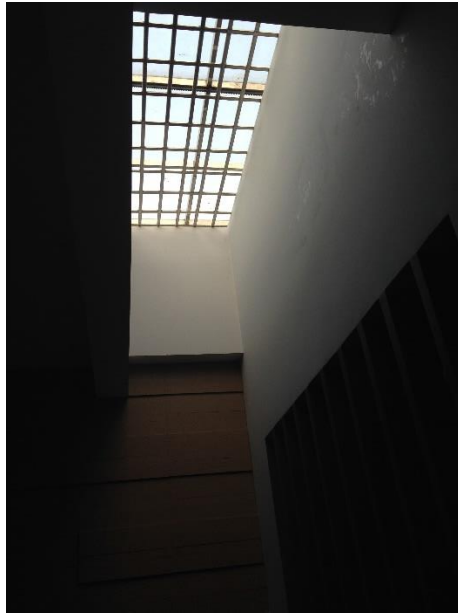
Staircase with transparent roof in a Danang shophouse, A1
